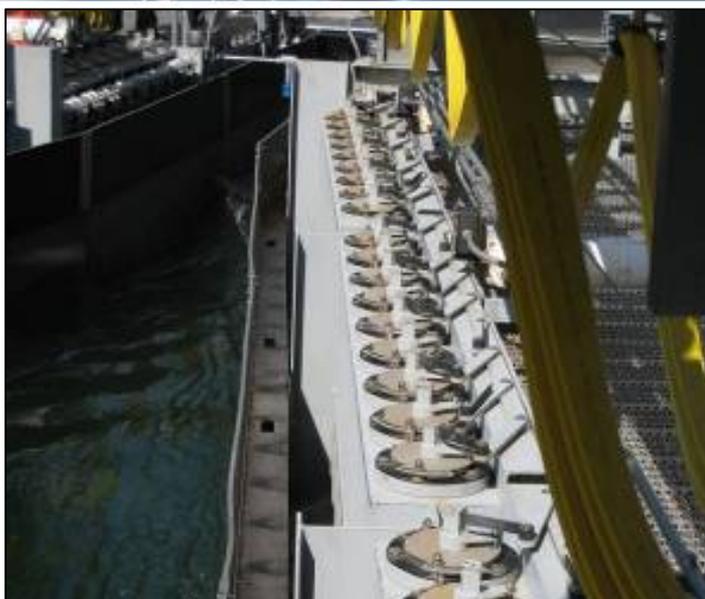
Typical Floor Screen Baffle – Full Open, Perspective 1
